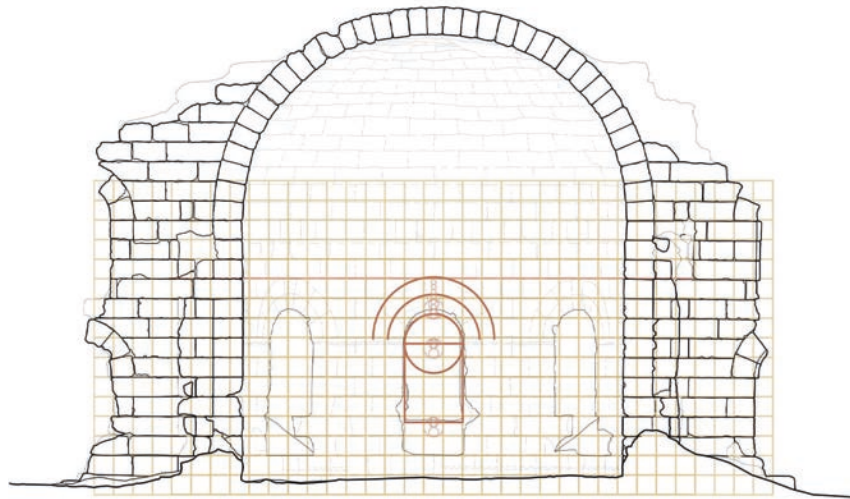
Geometric study in elevation and plan view on a grid with a module of 49 cm (one bes) (@AskGate).
